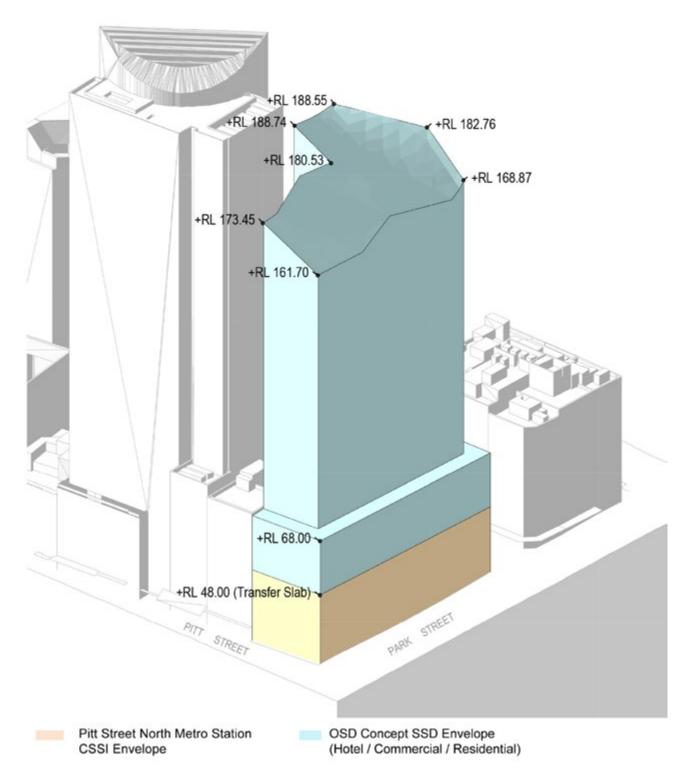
Proposed Pitt Street North OSD building envelope (axonometric diagram from southwest)
